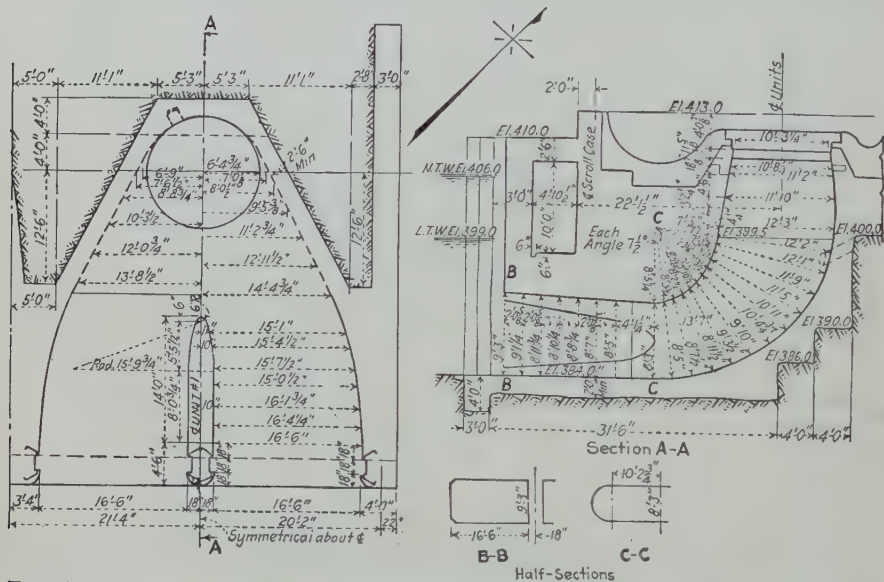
Details of draft tube—Bartlett's Ferry plant. (Courtesy of Stone and Webster Engineering Corporation.)
